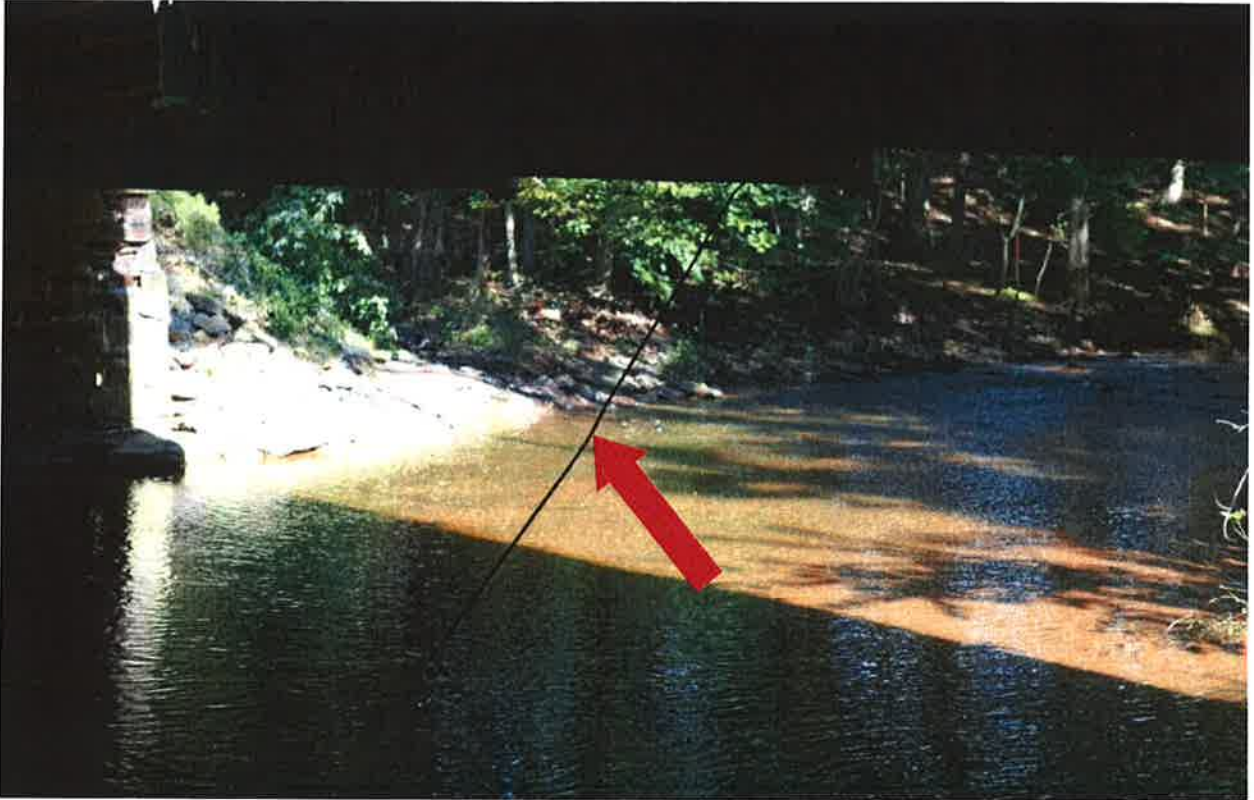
Loose underdeck lateral bracing members hanging down off the superstructure. Looking North
